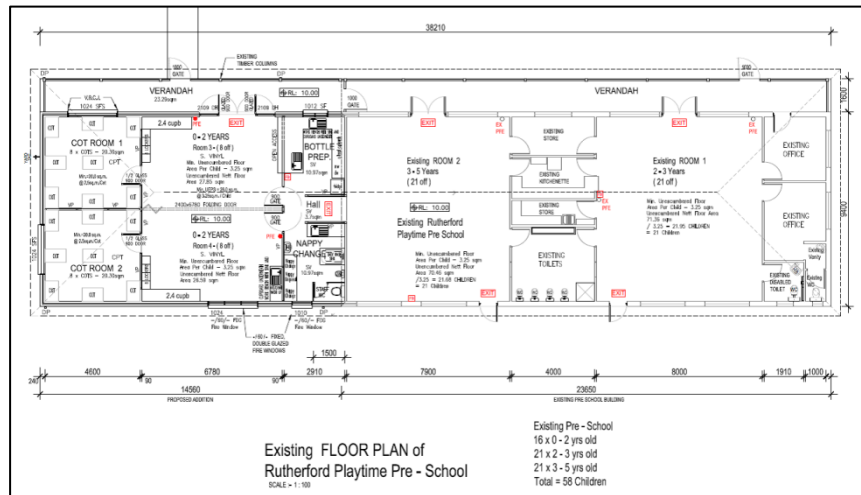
Existing Ground Floor Internal room layout – Childcare centre.
